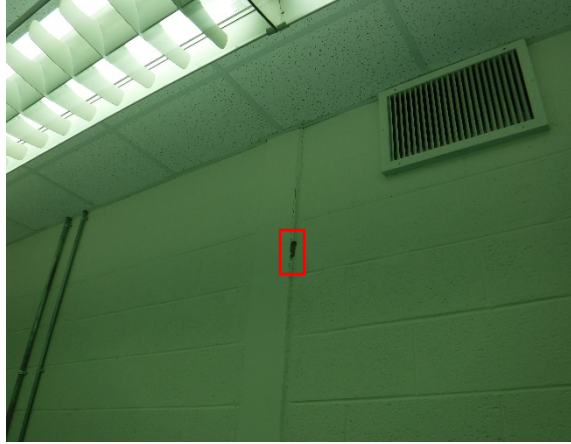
Photo of sample AS-28, Room 110, Wall – Expansion Joint Compound, White/Grey, 0.27% - 1.9% Chrysotile Asbestos.
